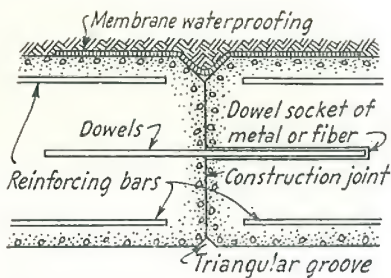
Horizontal section of vertical construction joint sometimes used in abutments. The dowels are bonded to the concrete on one side only.
